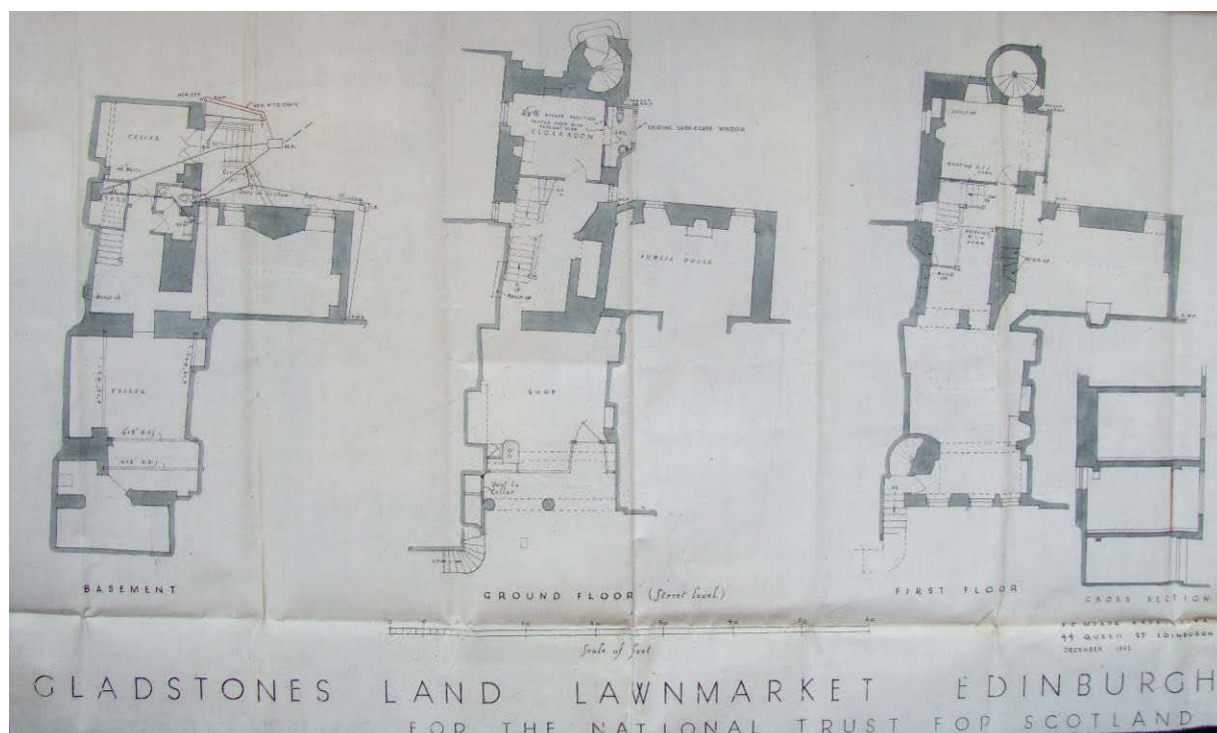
Plans and section showing basement to first floors. Minor alterations warranted 5th February 1943. City of Edinburgh plan store
